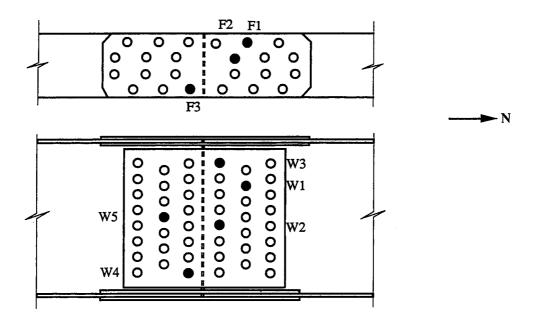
(d) Location of sampled bolts in connection S2 of bridge B2
